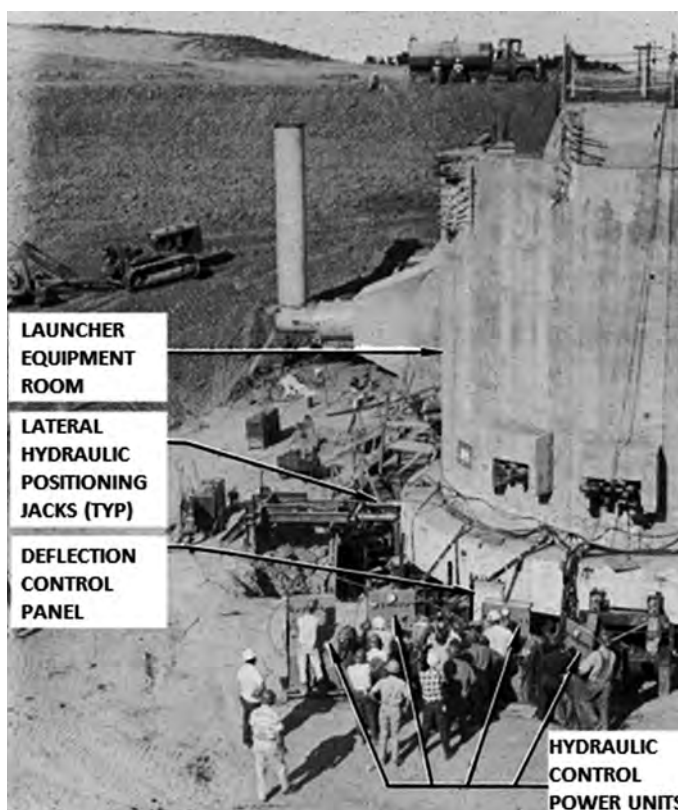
During construction at Grand Forks AFB two of the launcher equipment rooms settled beyond specifications. The structures were excavated and repositioned using massive hydraulic jacks. A similar technique was used to repair LF-28. (Courtesy of Boeing Company.)
